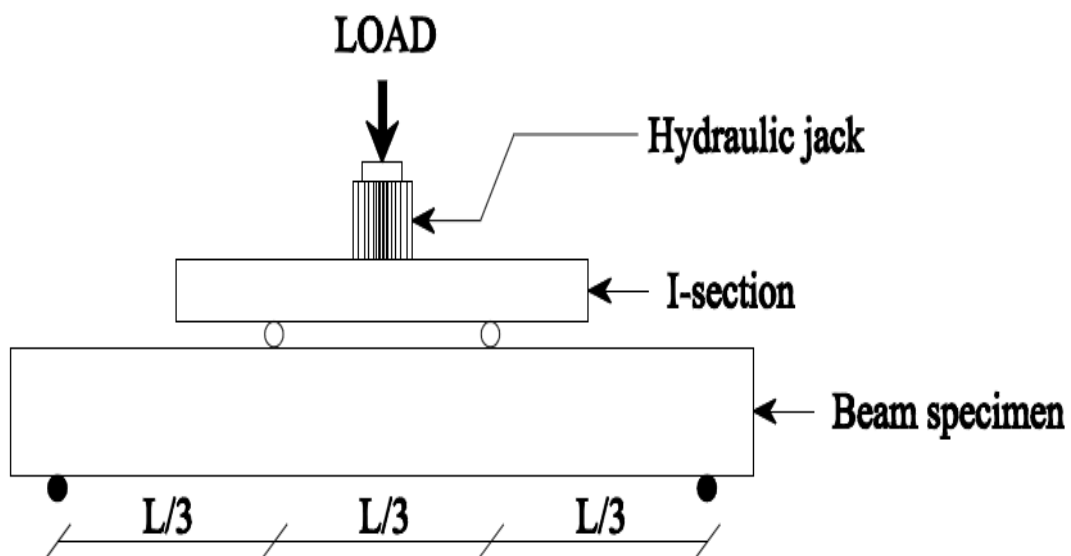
TEST SET UP FOR FLEXURAL TEST OF REINFORCED BEAMS
